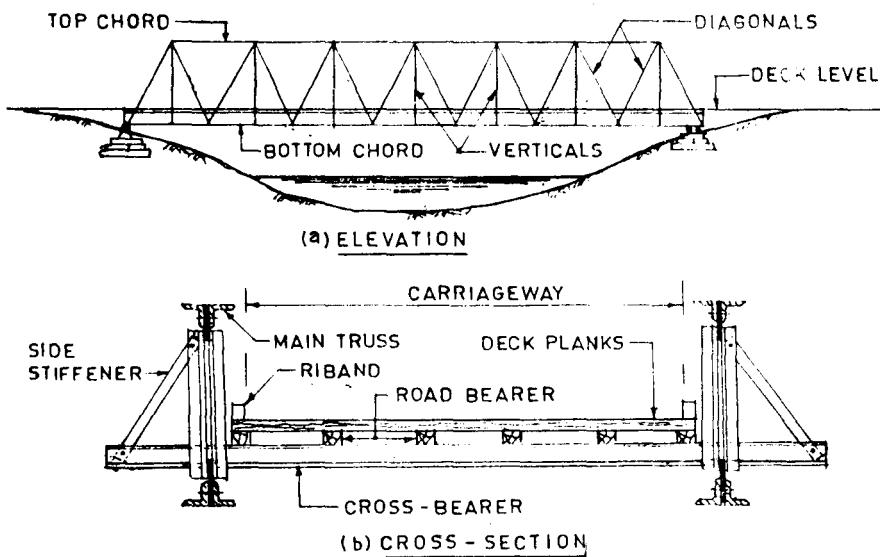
CALLENDER - HAMILTON (UNIT CONSTRUCTION)
